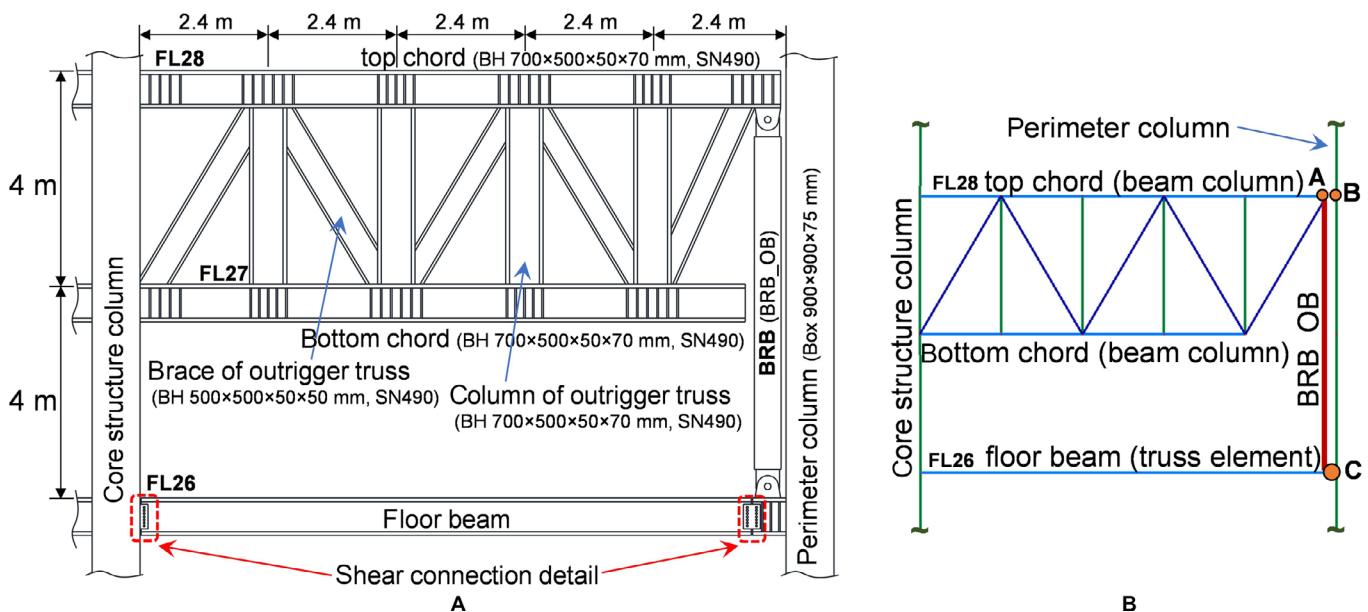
(A) Design detail and (B) MBM model of the OB outrigger
